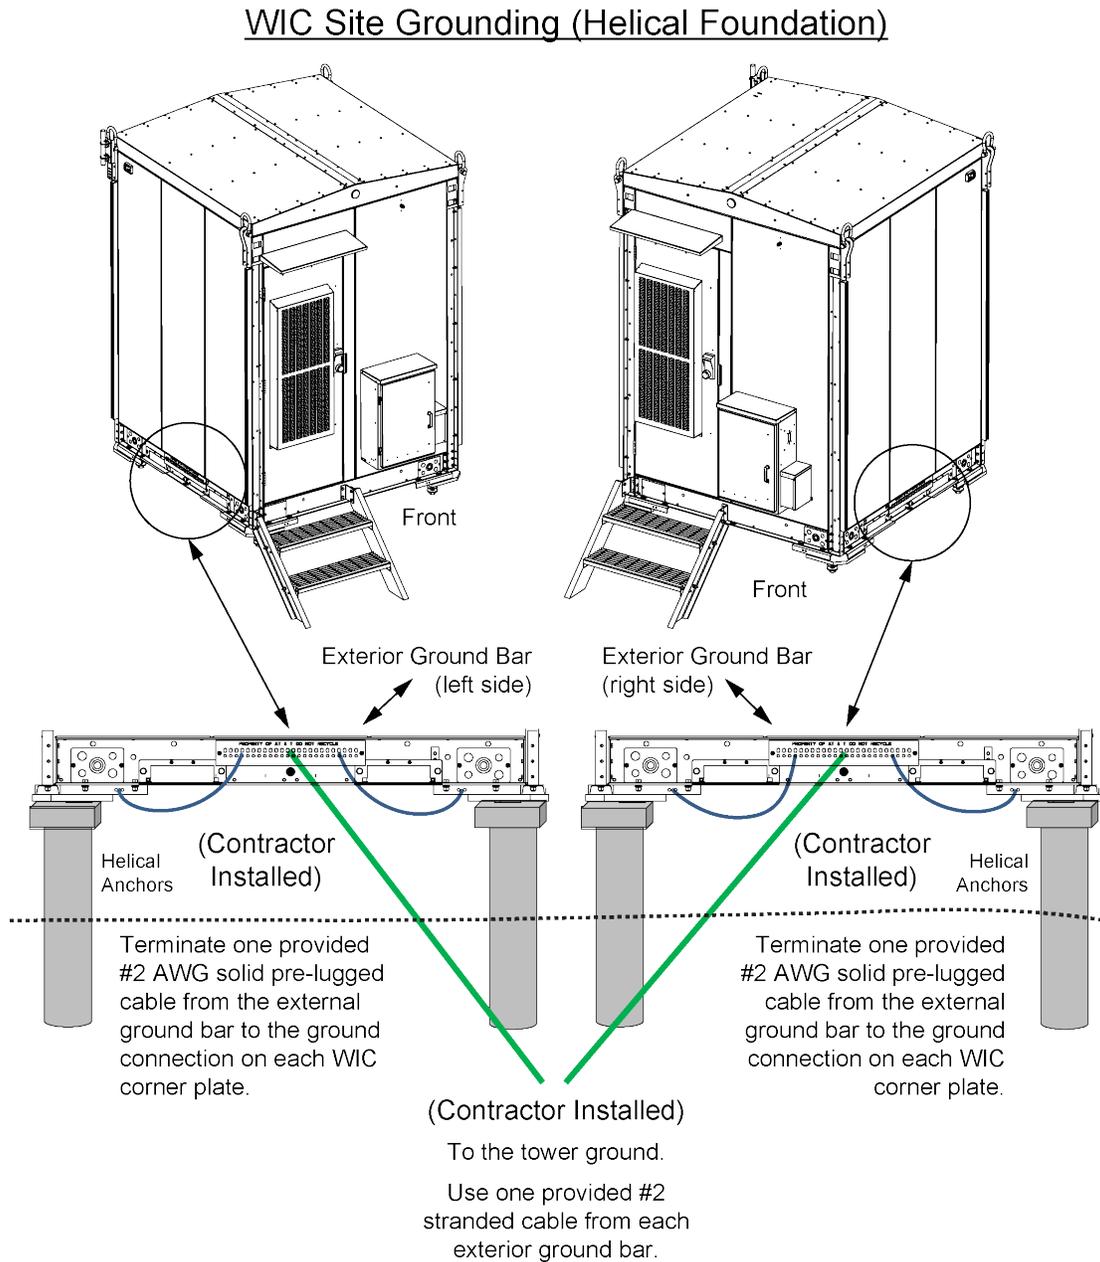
WIC Site Grounding Scheme (Helical Foundation)
